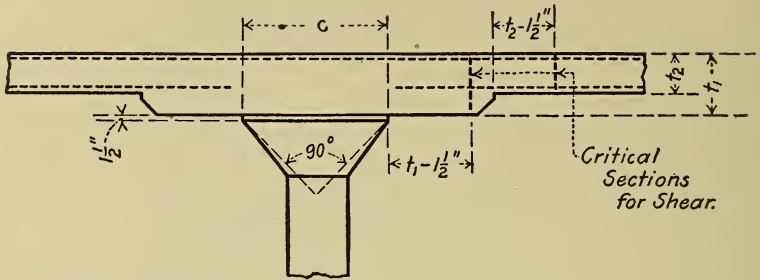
Typical Column Capital and Sections of Flat Slab with Dropped Panel.
